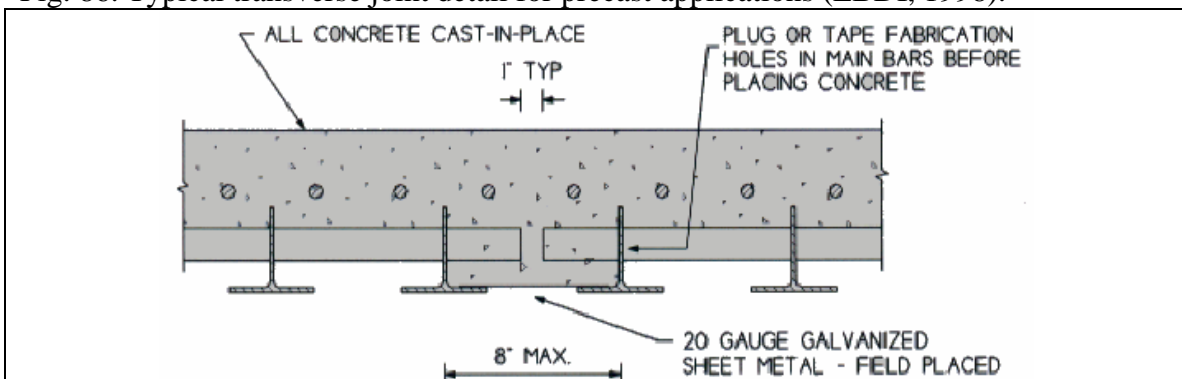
Typical transverse joint detail for cast-in-place applications (EBDI, 1998)
